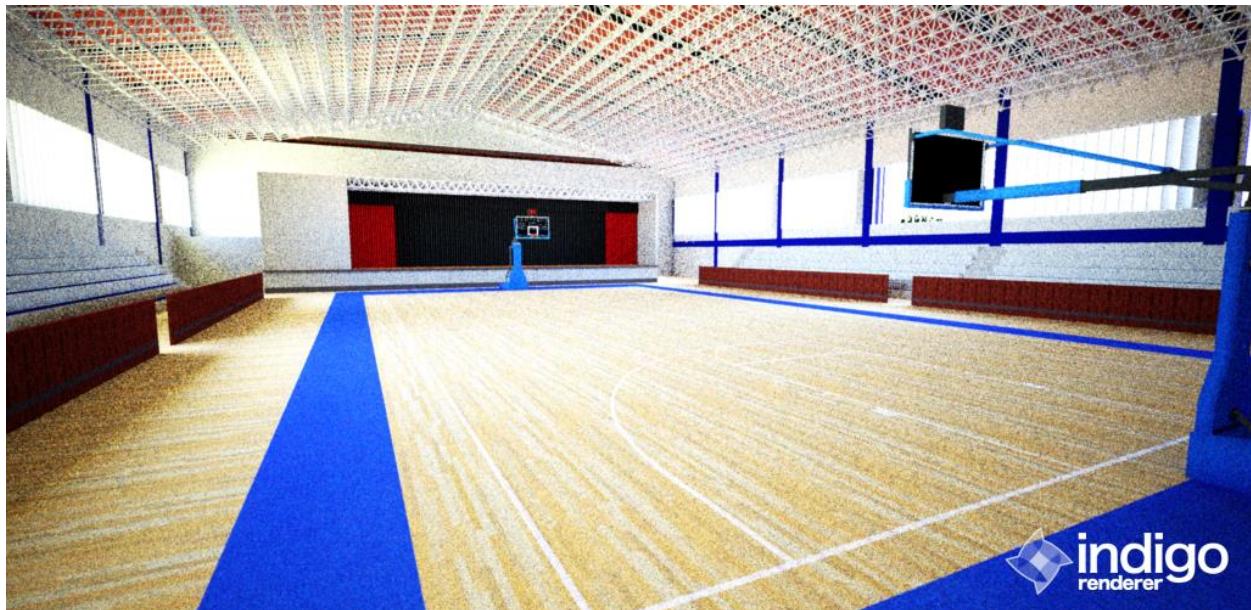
GYMNASIUM 1 BASKETBALL COURT VIEW
